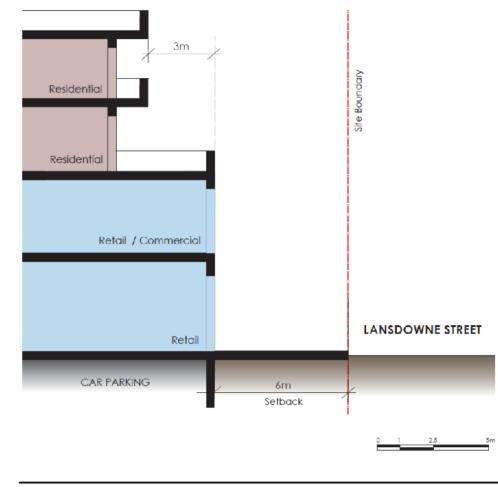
Lansdowne Street Setback - Section A-A
